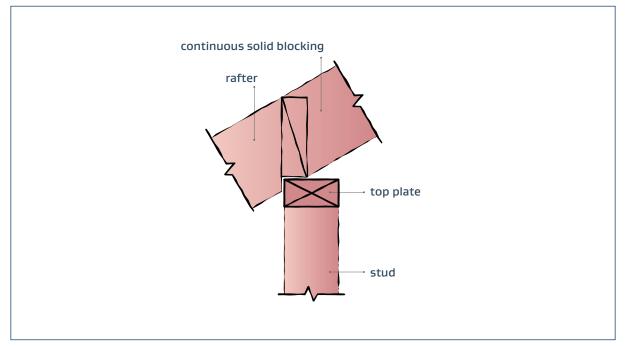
Rafters on a top plate must sit on a bird's mouth joint
